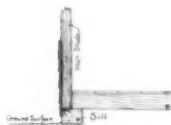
The primitive foundation consisting of a wooden sill on the ground, with studs and floor beams resting on top.
